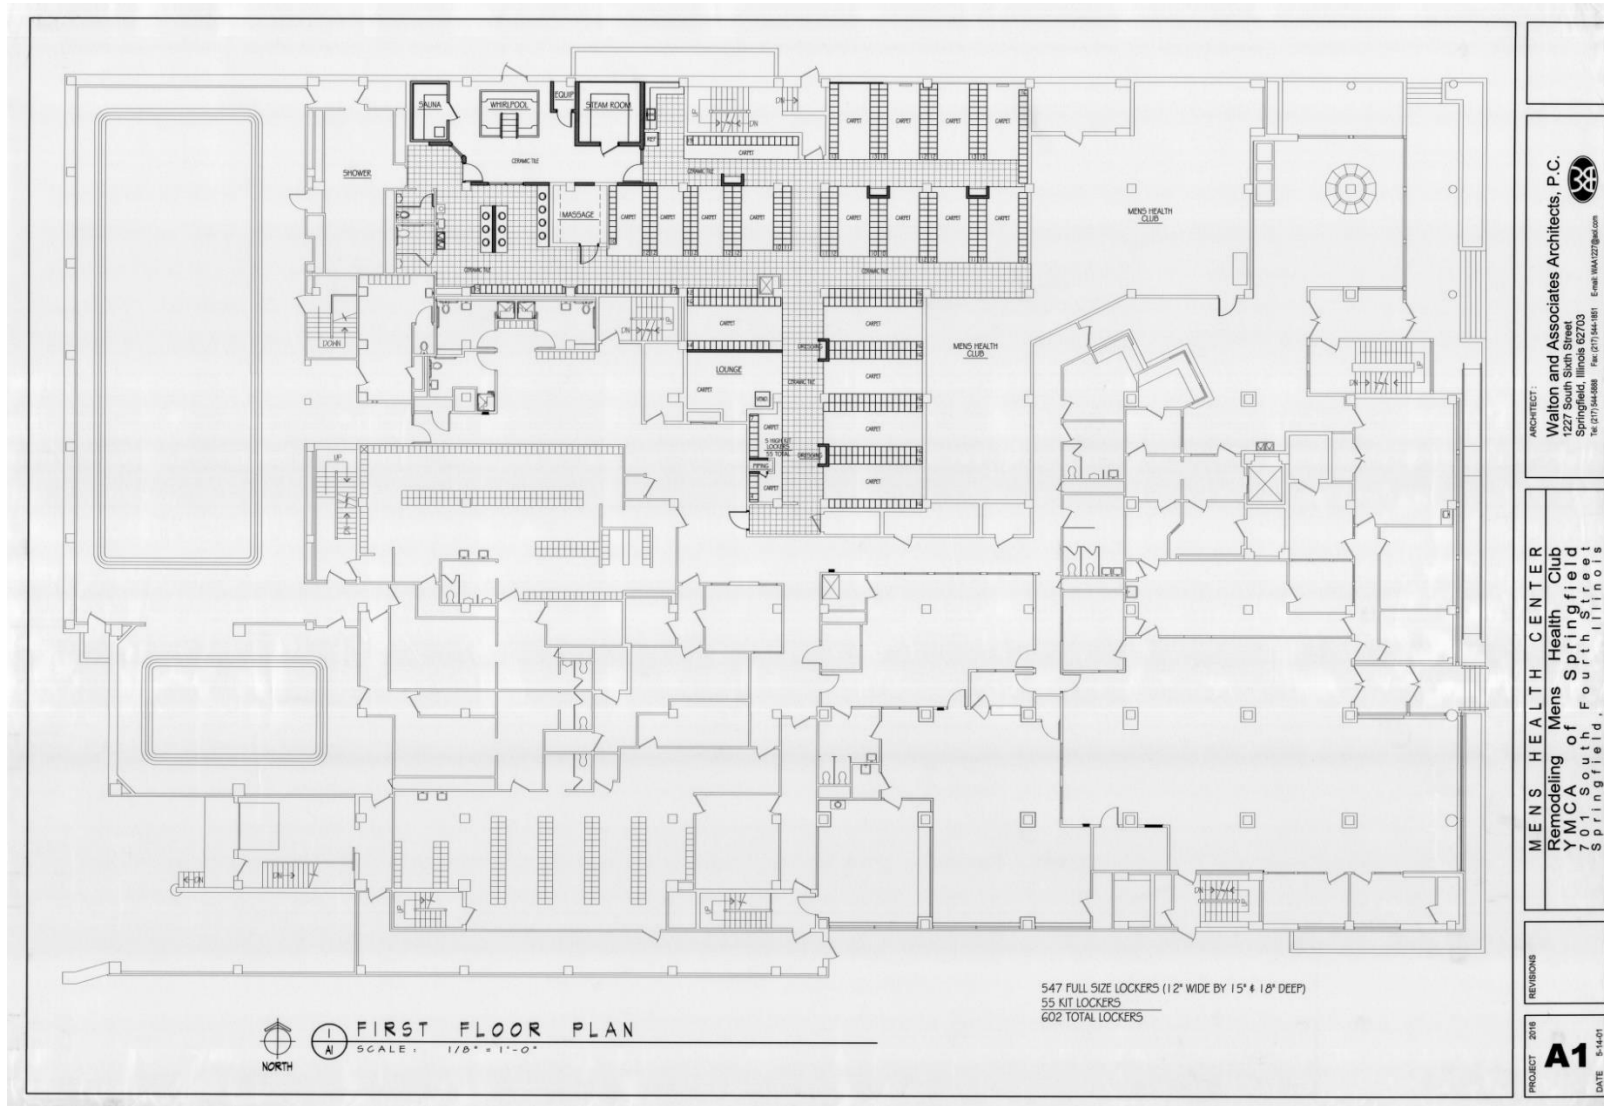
First Floor Plan, Men's Health Center (Walton and Associates 2001; Sheet No. A1).
